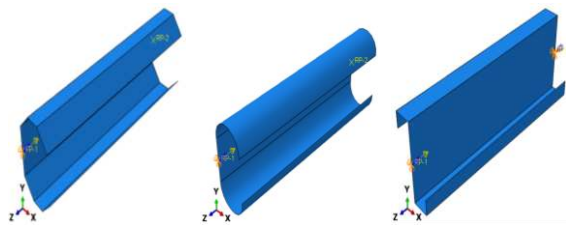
Loading and Boundary Conditions of (a) Folded Section (b) C-Section (c) Z-Section
